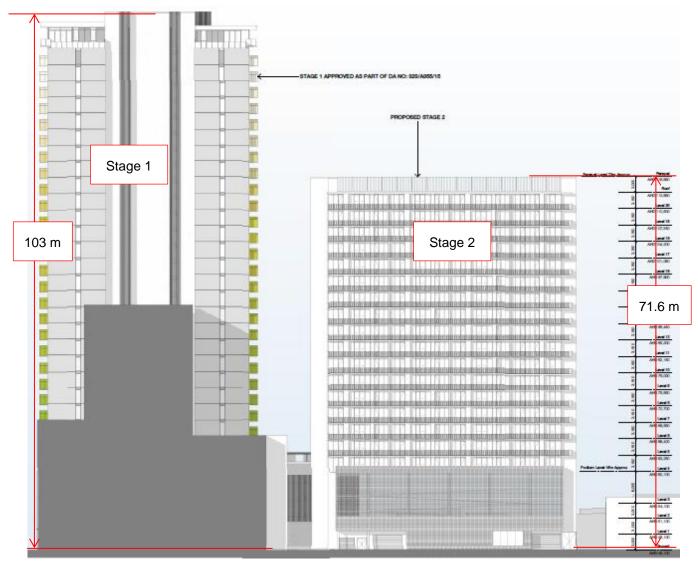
West elevation of the proposed development (Stage 1 and 2)
